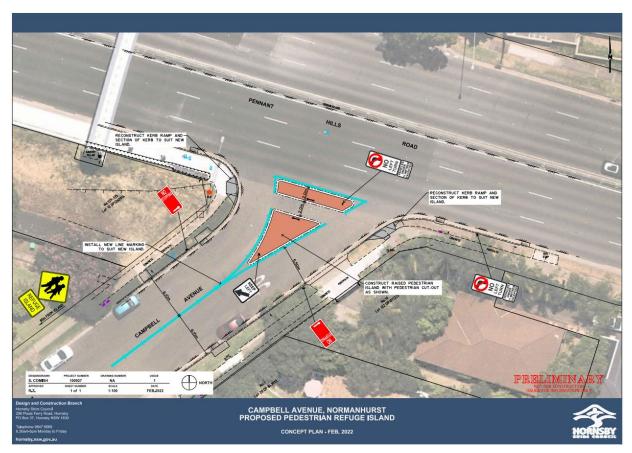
Proposed Installation of Pedestrian Refuge on Campbell Avenue, Normanhurst
